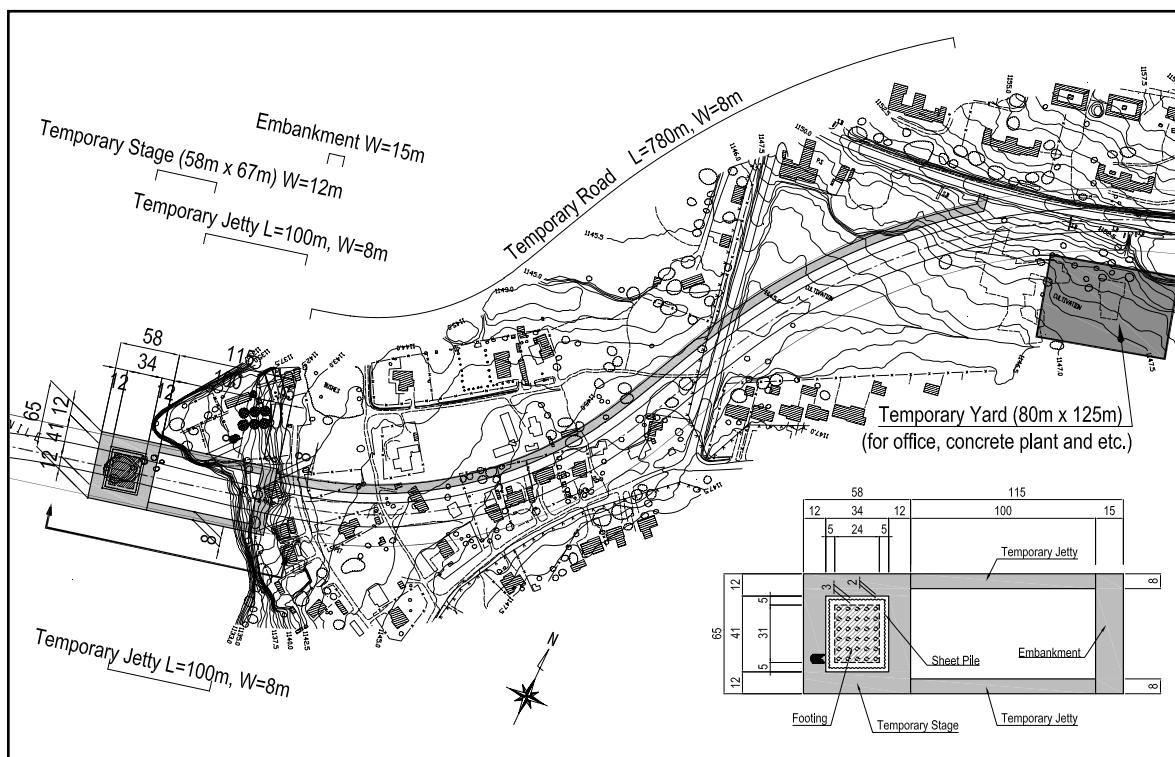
Location of Temporary Road and Yard at Njeru side
